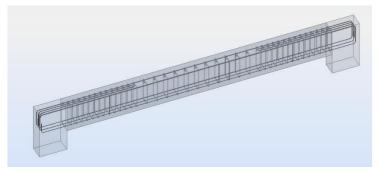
Detail of reinforcement in the foundation beam trough Robot.
